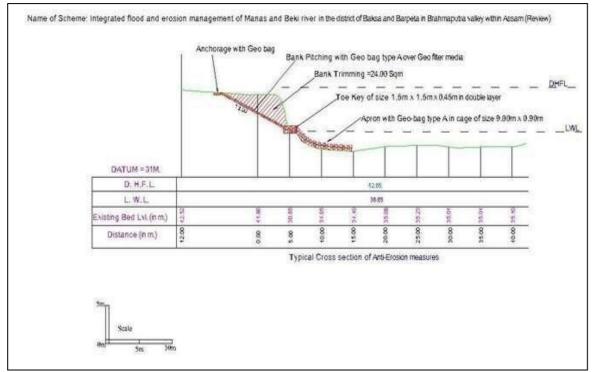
Typical Cross-Sections of Proposed Anti-Erosion Works
